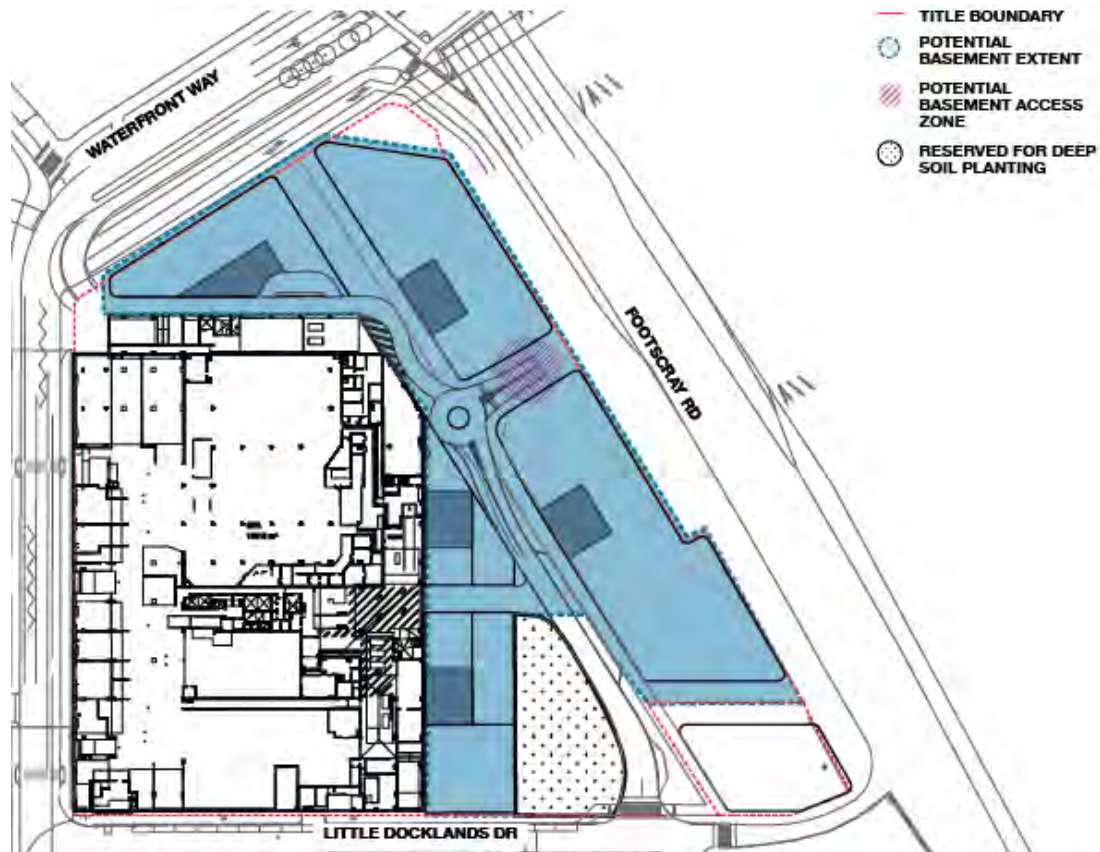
Movement and Parking Plan 5 - Possible basement extent
